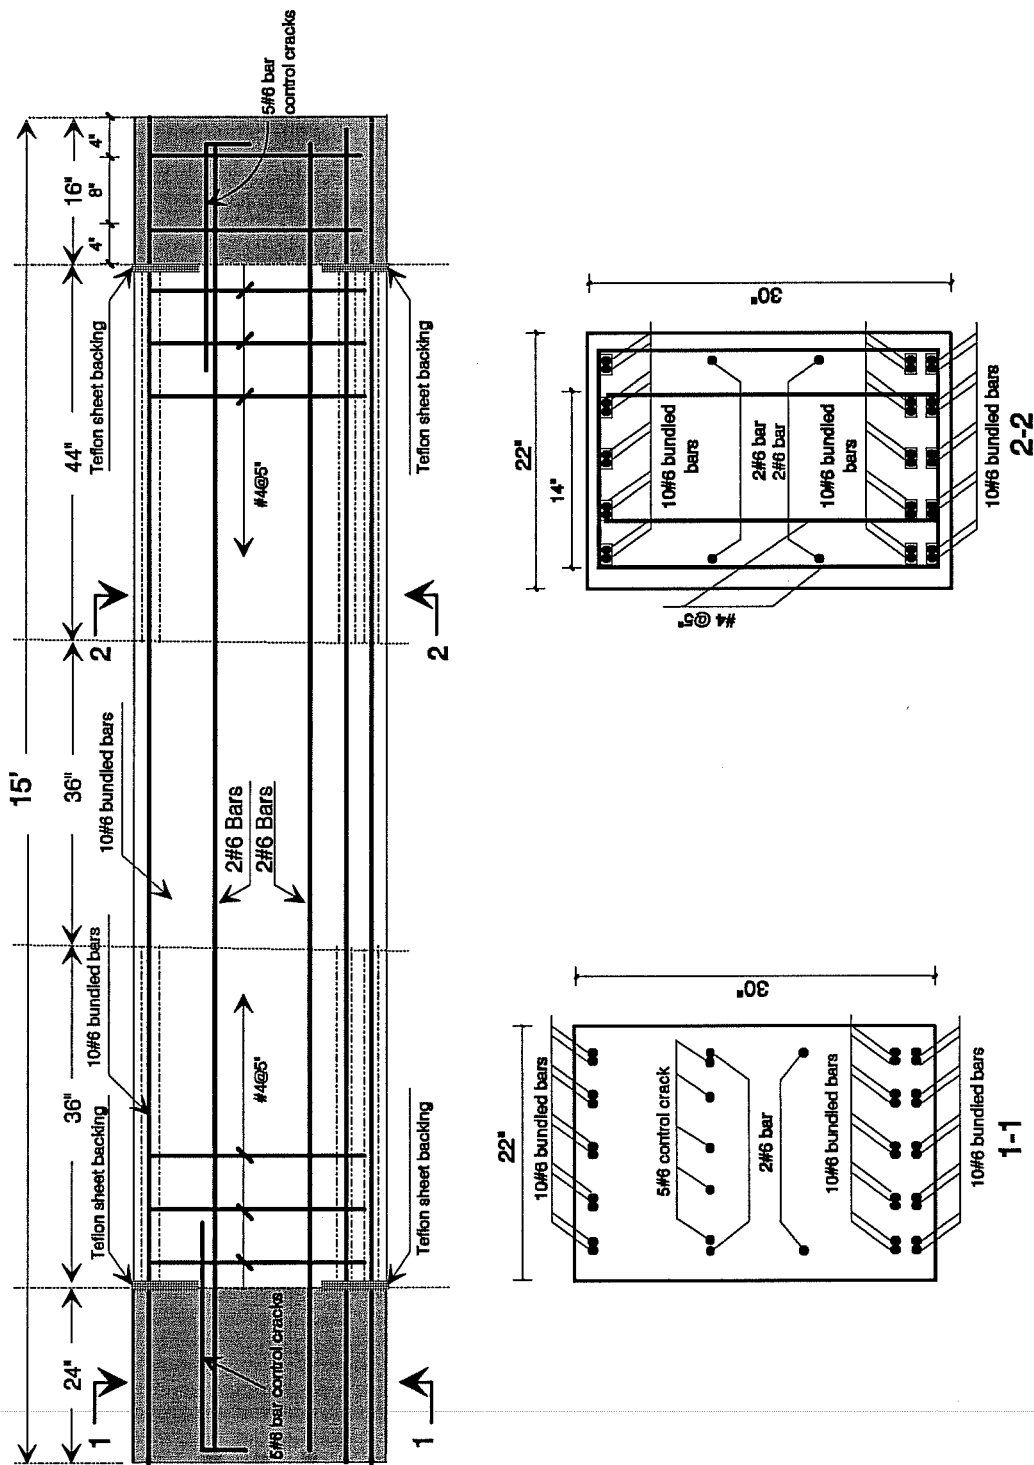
Details of specimen # 2 (with teflon sheet backing)
